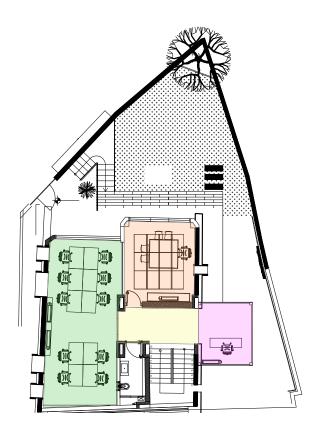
The ERKE Desing Office, Ground Floor Layout
